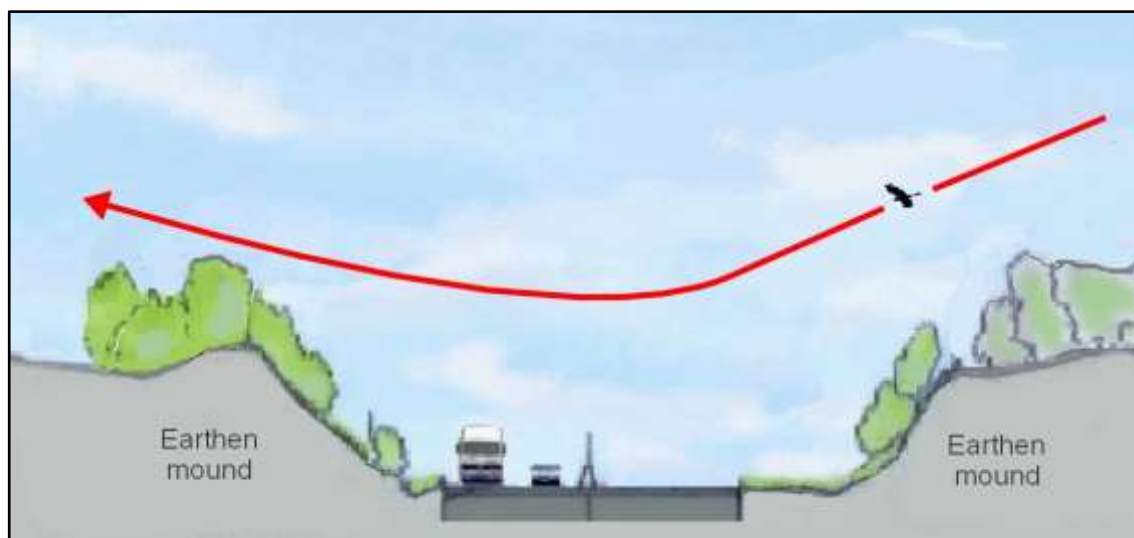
Earthen mounds on either side of a roadway, bird flying high above the traffic (Source: [14]).
